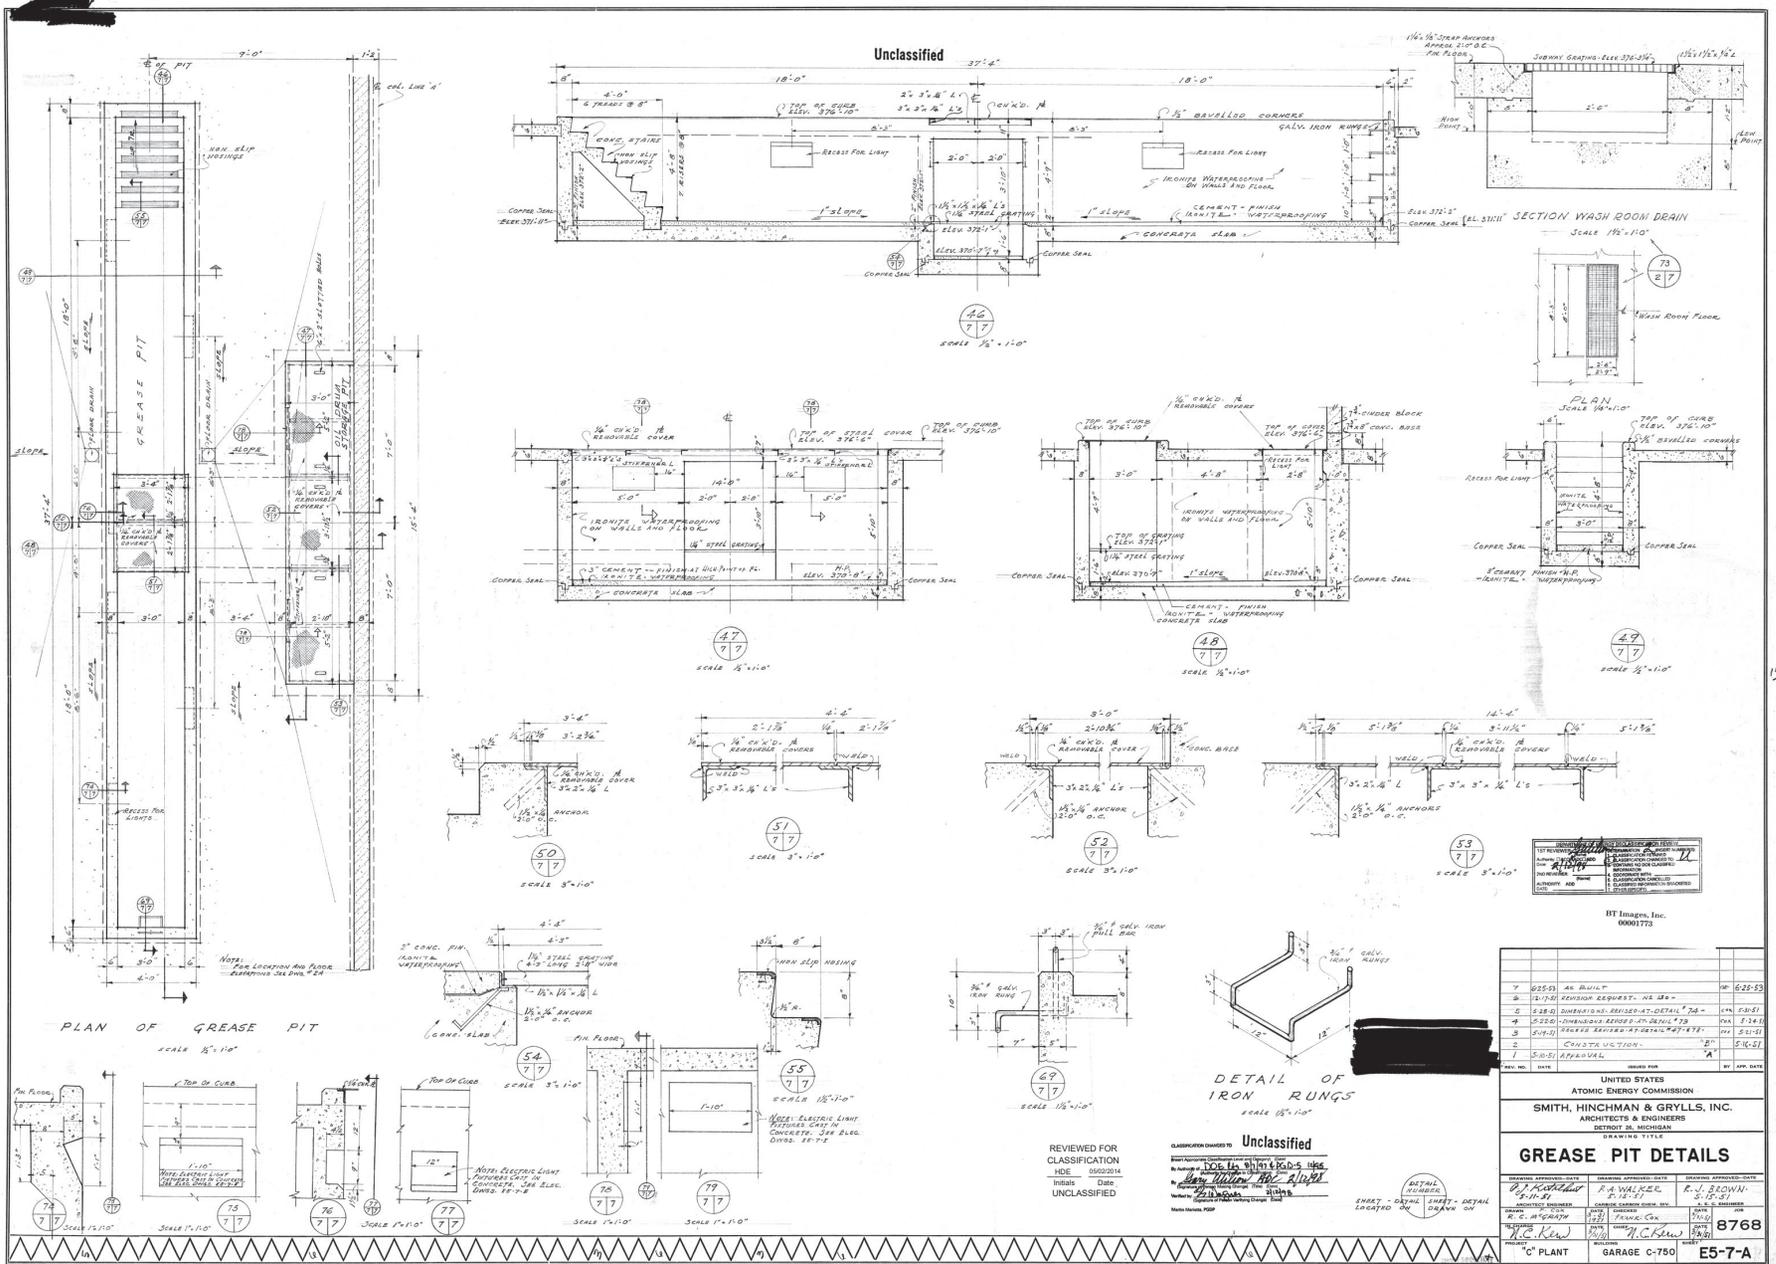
Engineering Drawing ES-7-A_0001_0007_U-01780
